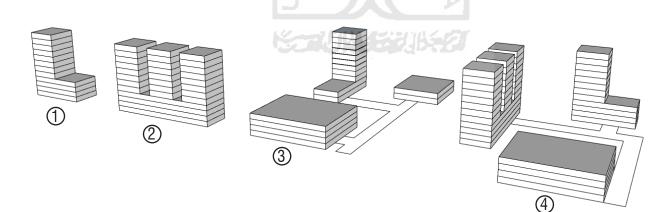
Illustration of different mixed use building layout Source: Author (2021)
